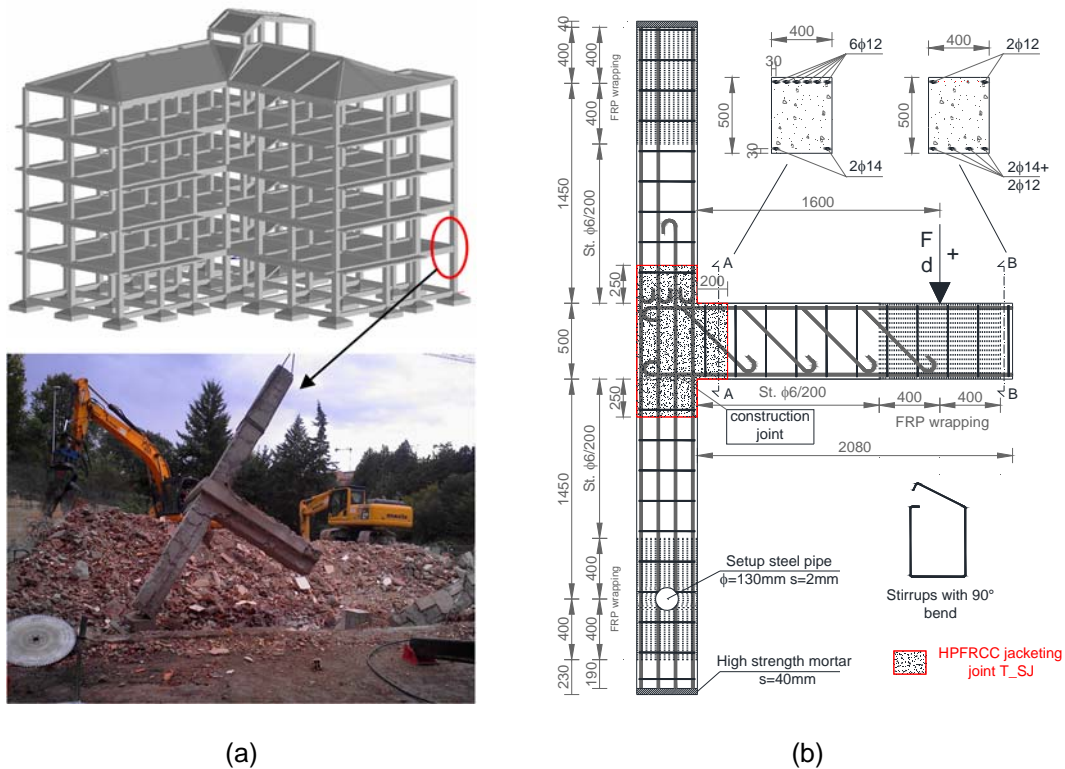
Case study building demolished after the L'Aquila 2009 earthquake and reference joint subassembly (a); geometry and reinforcement details of the reference joint.
